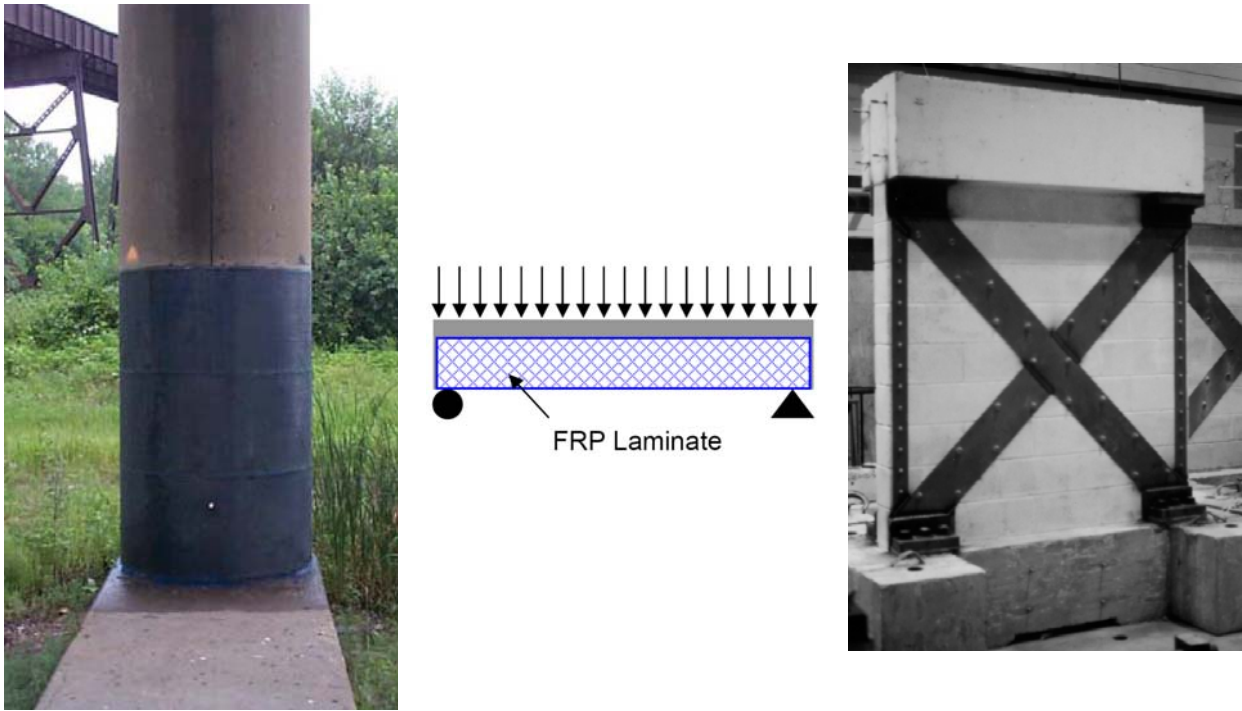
a) Reinforced concrete column wrapped with carbon composite; b) sketch of a reinforced concrete beam strengthened with FRP laminates, Ellingwood et al. (2007); c) masonry panel reinforced with steel strips, Taghdi et al. (2000)
